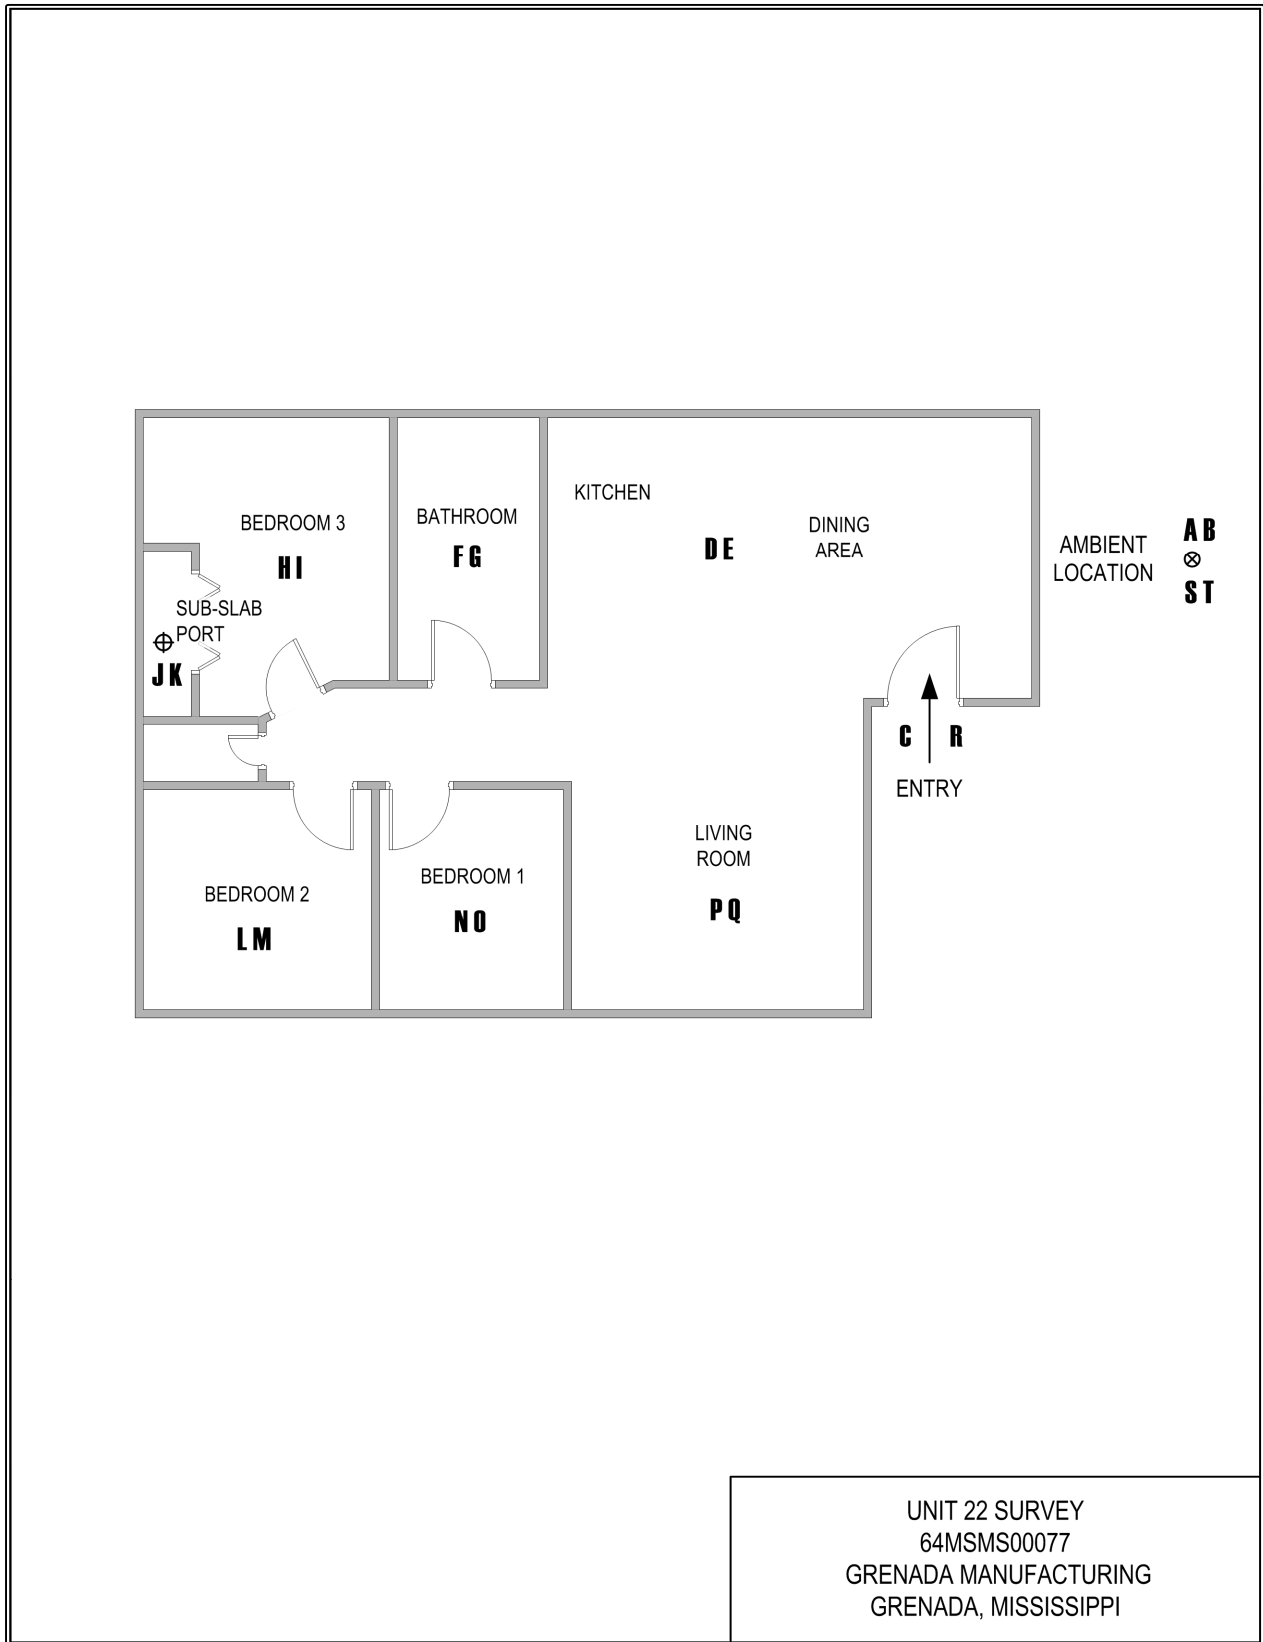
Unit 22 Survey Floor Plan, 64MSMS00077
